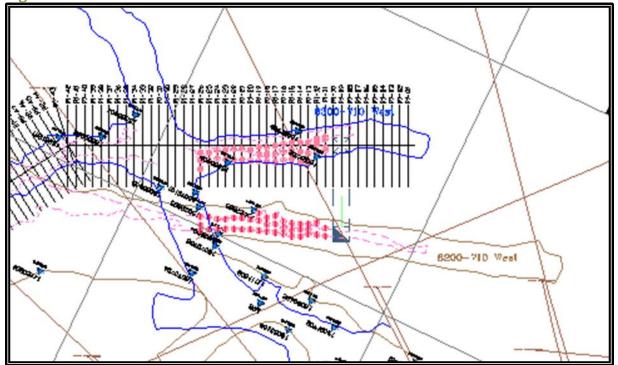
shows a typical over-cut and undercut access and sill in plan view, and Figure 24-8 shows a typical drill ring section.
